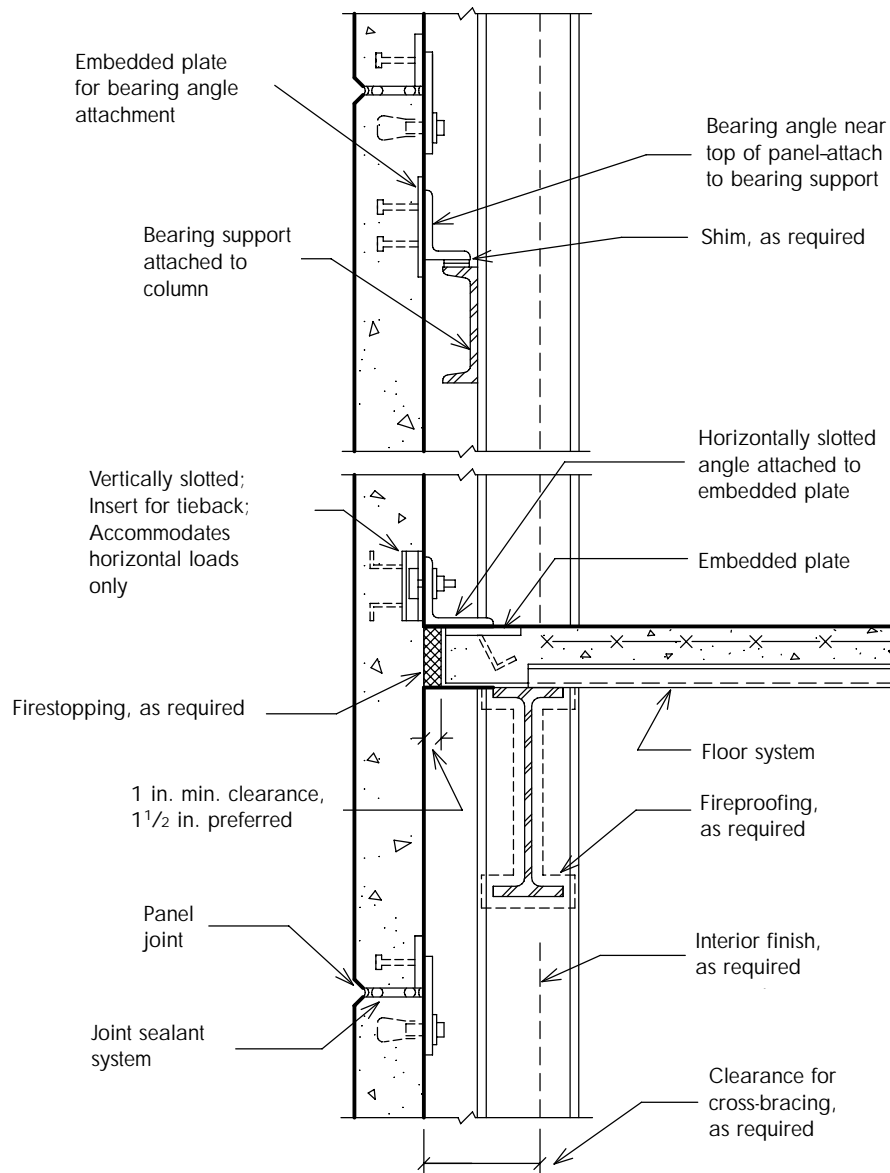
Detailing Considerations for Precast Concrete Panels (Sample Wall Section Detail at Horizontal Span Precast Panels)
